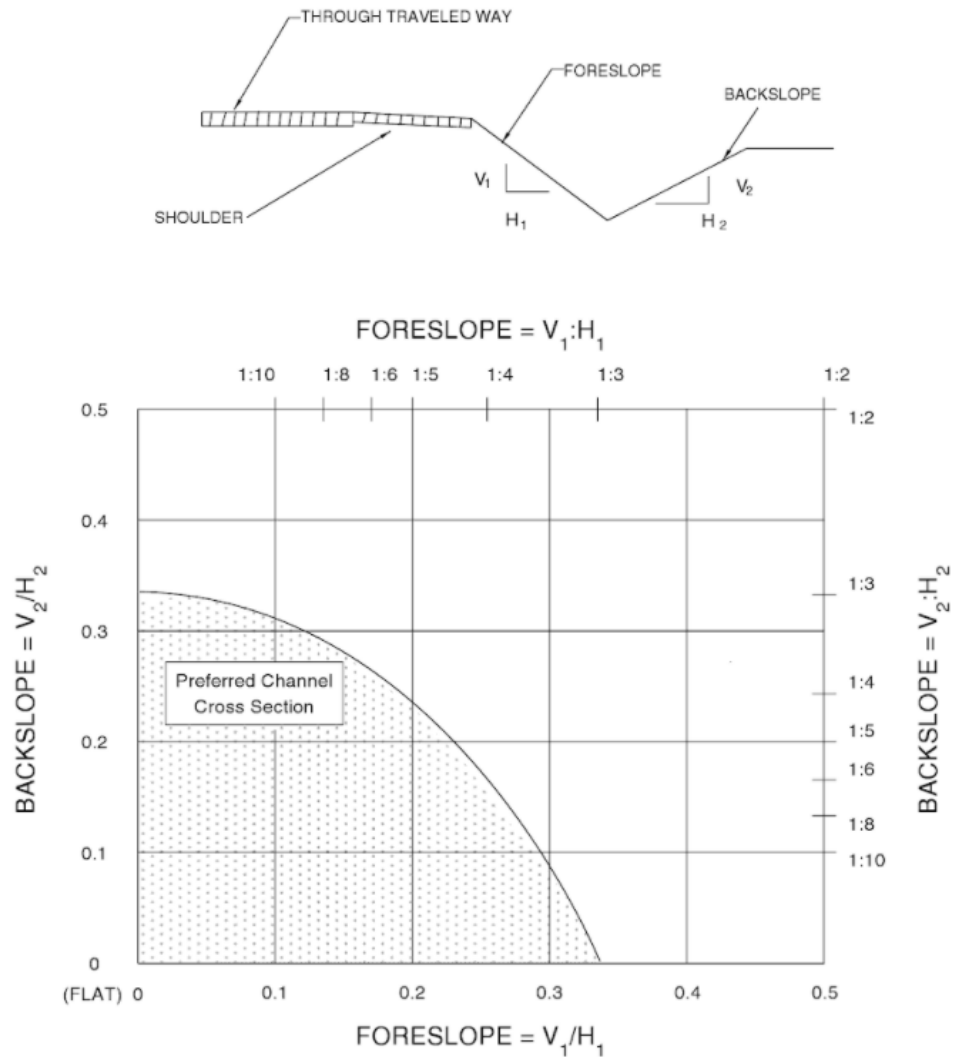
Traversable channel geometry for Vee ditches, rounded channels with a bottom width less than 8 feet and trapezoidal channels with a bottom width less than 4 feet. Source: AASHTO Roadside Design Guide
